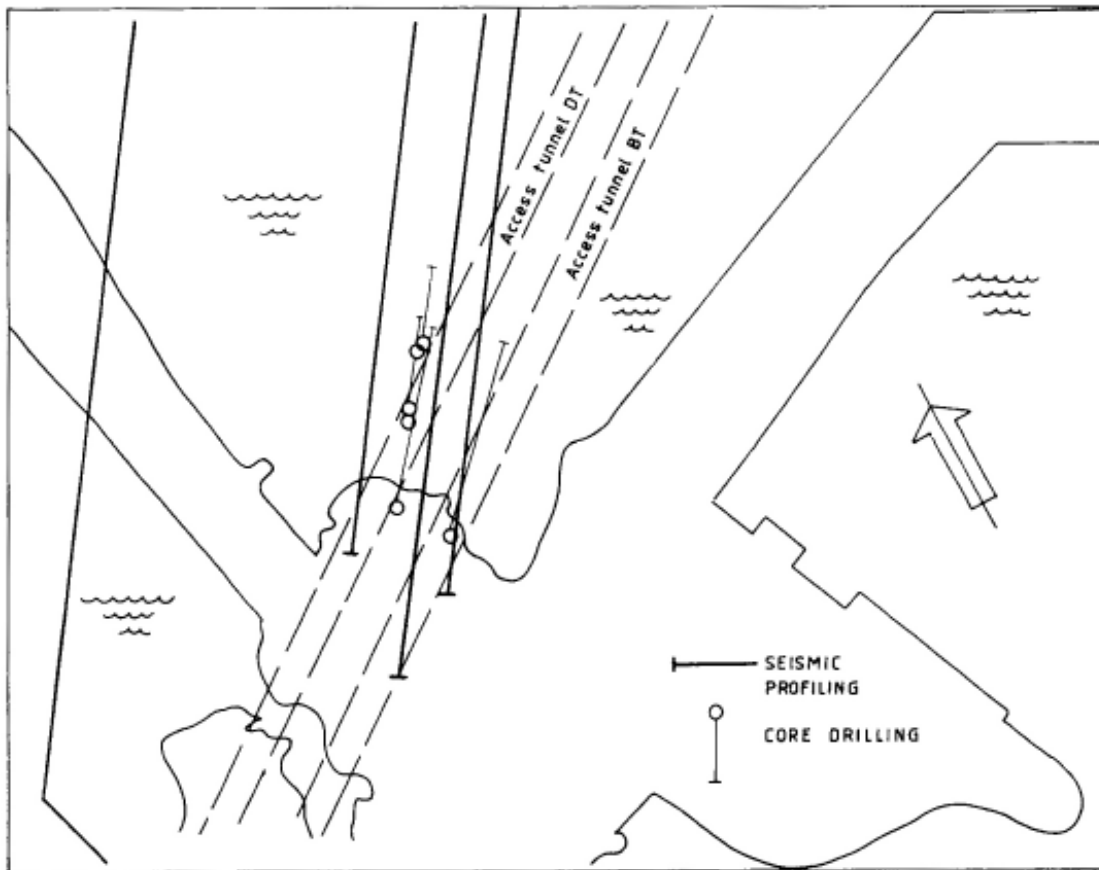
Borehole layout, in plan and section for the Singö deformation zone in the area of the access tunnels to the repository, SFR.
